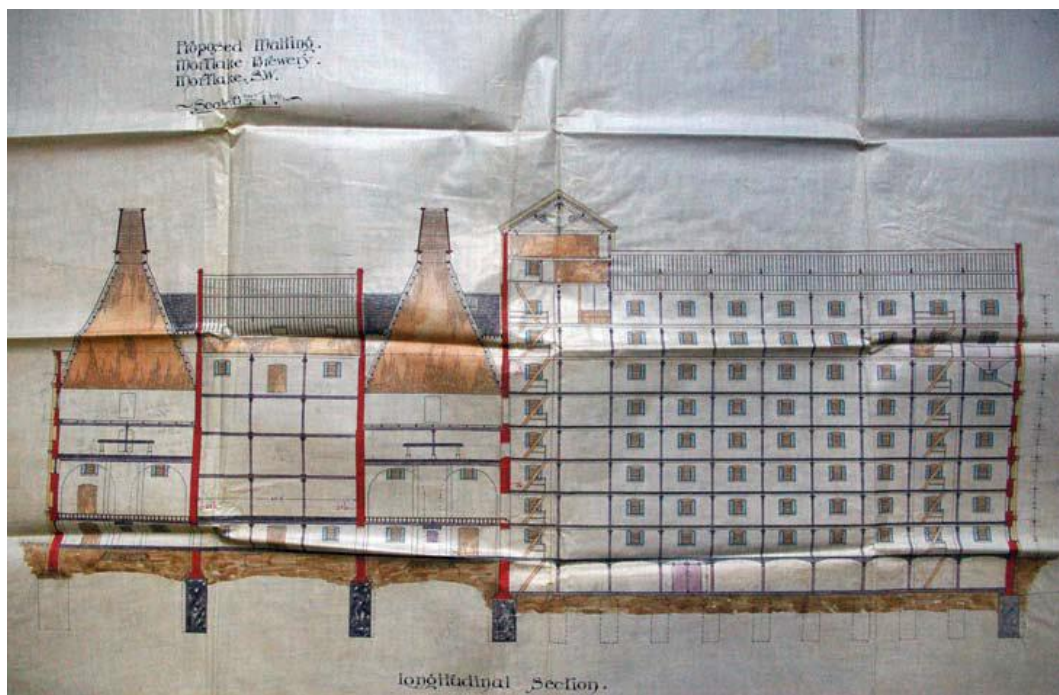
Architect's drawing of the proposed north elevation of the new maltings, including the now demolished kiln block to the west (left)
